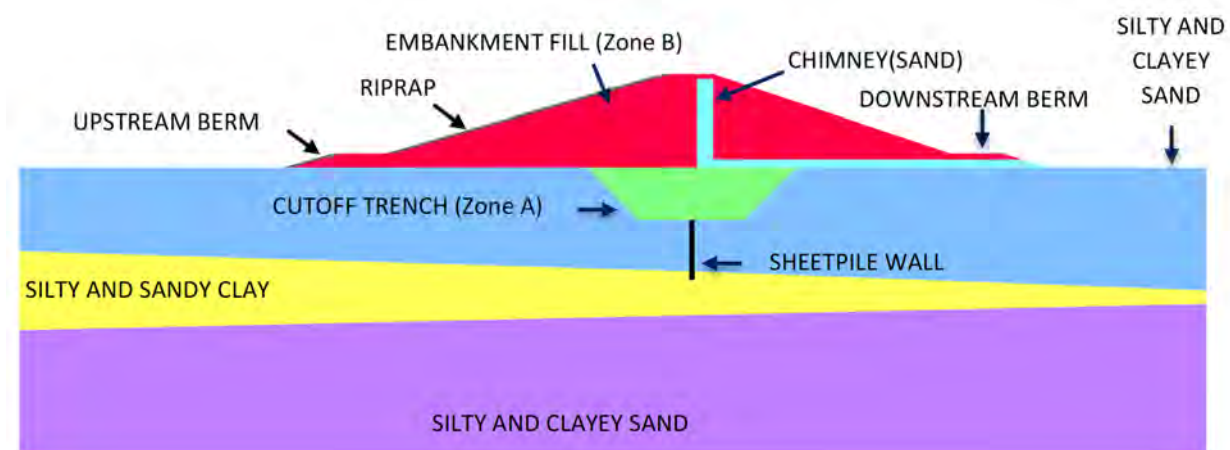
Typical Geometry and Zonation for Alternative 1—Birch
